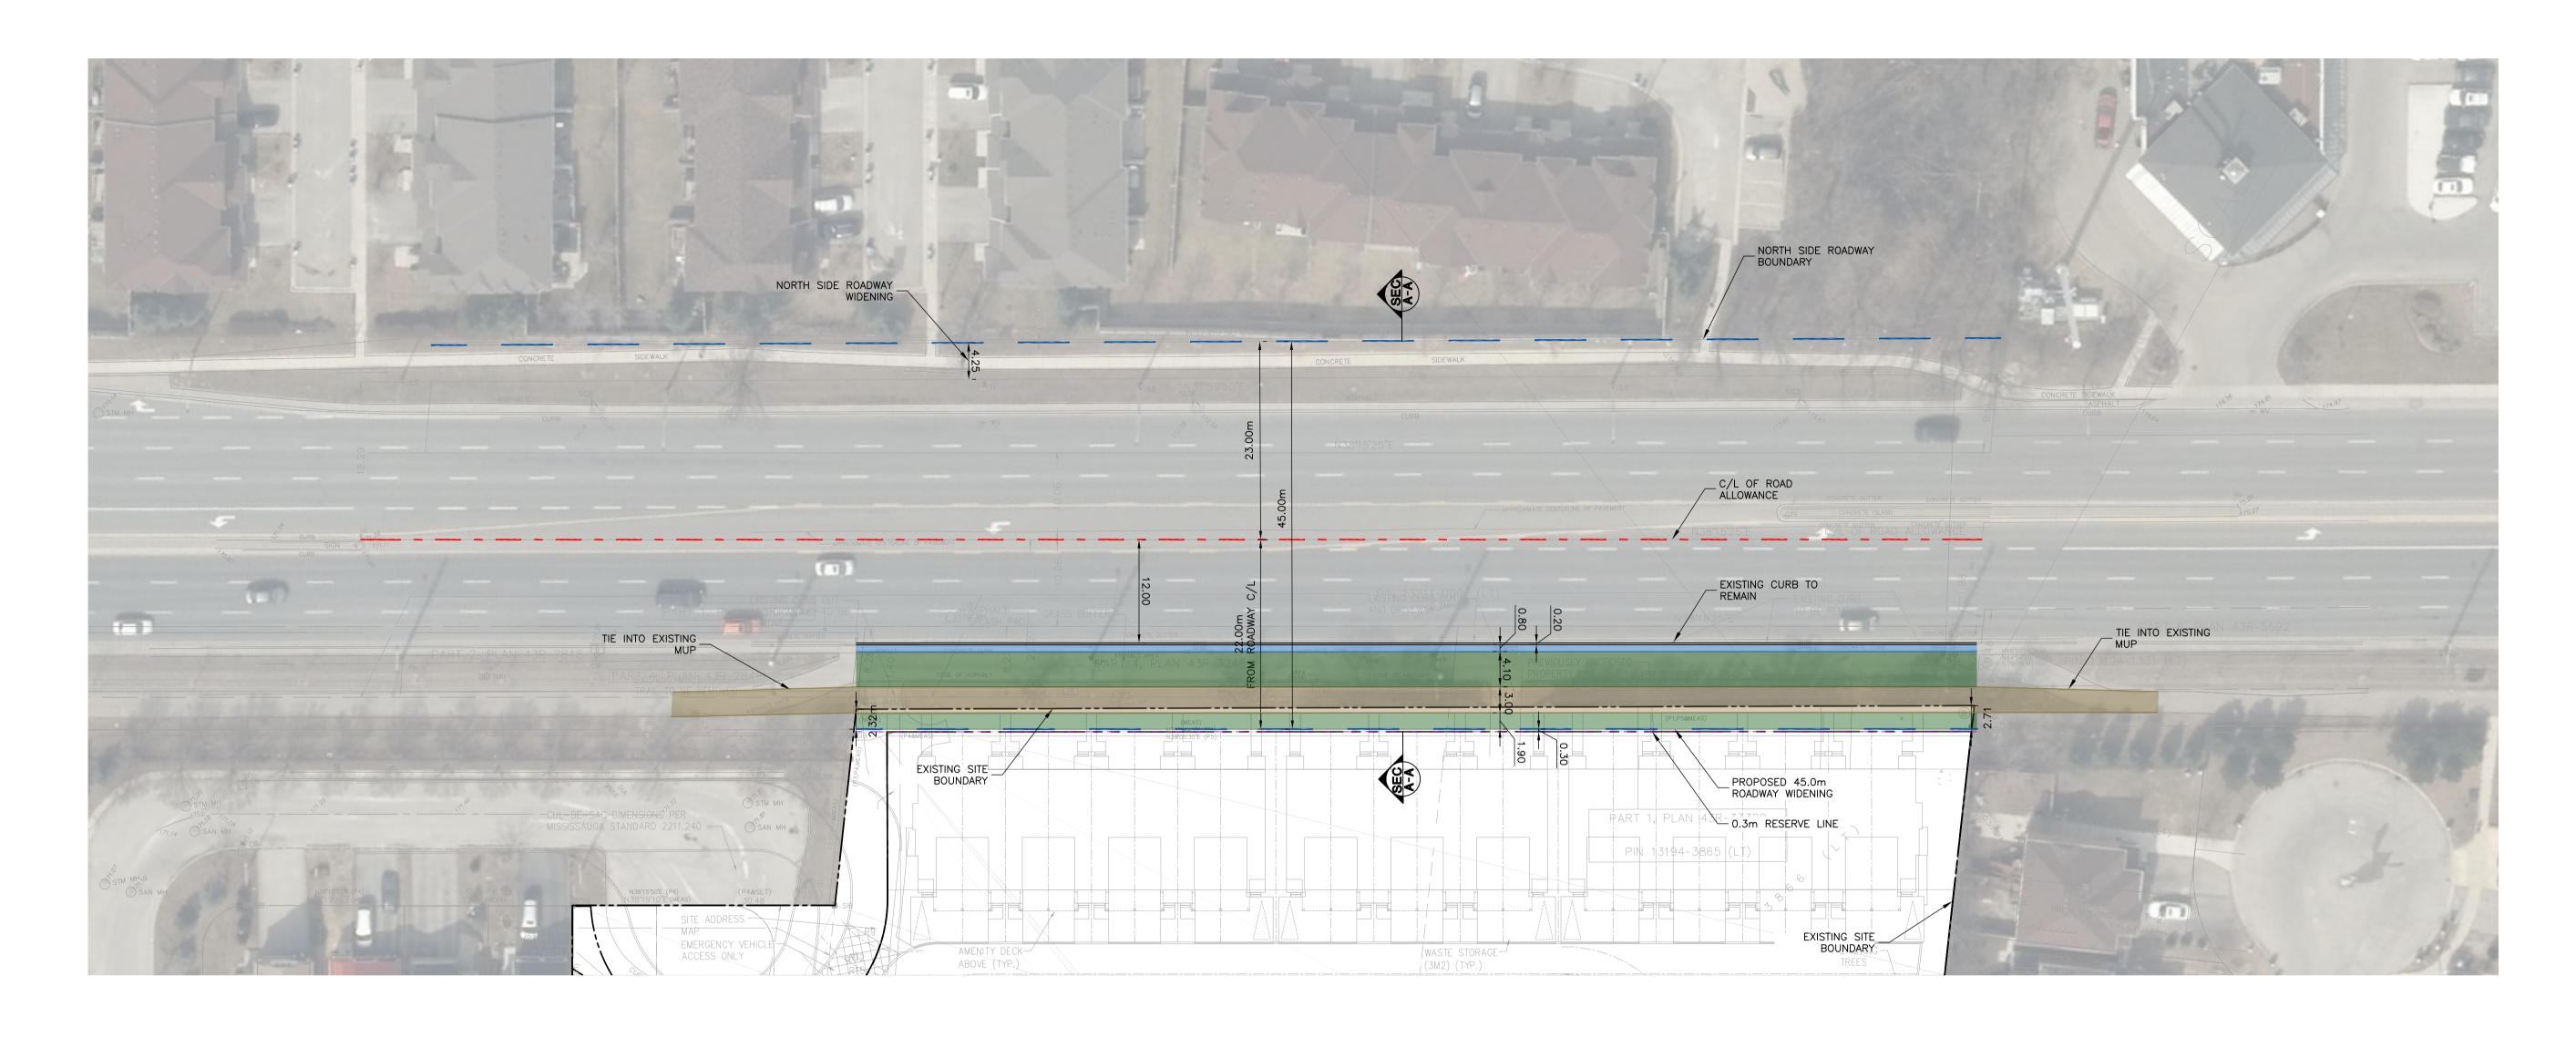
1240 Britannia Road West Draft Plan of Subdivision and Proposed Britannia Road ROW
